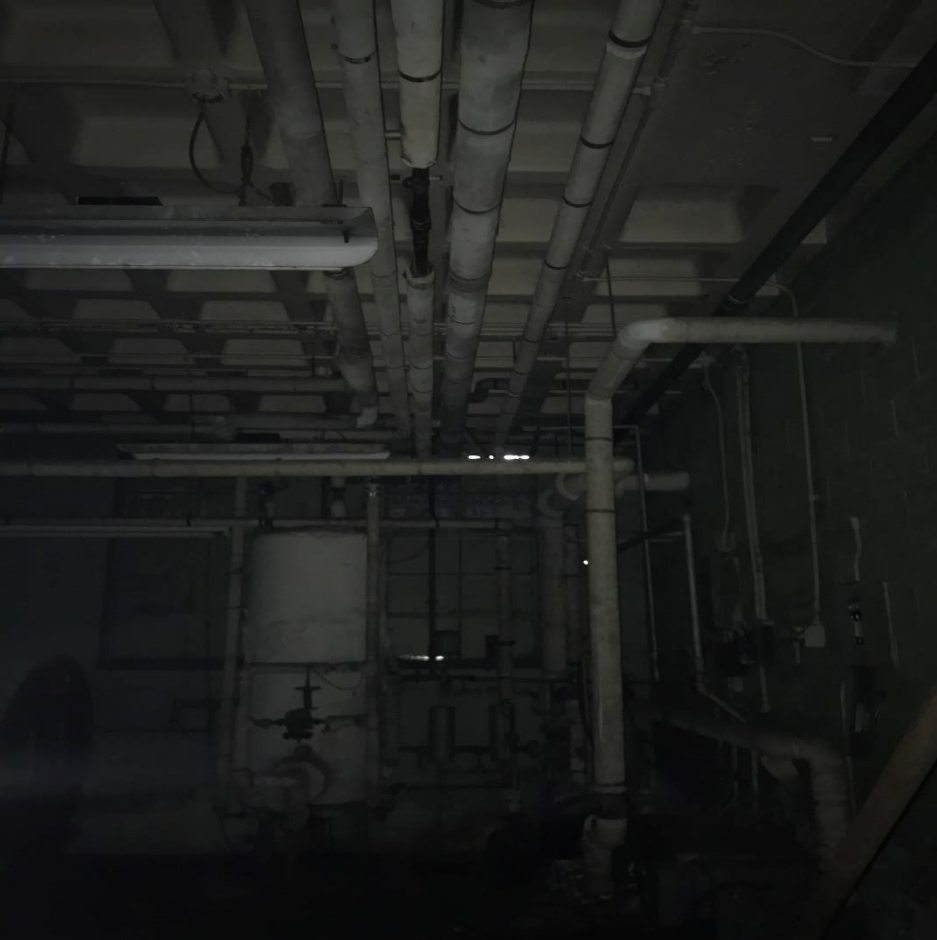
SE Basement Corner Pipe Insulation in Boiler Room
